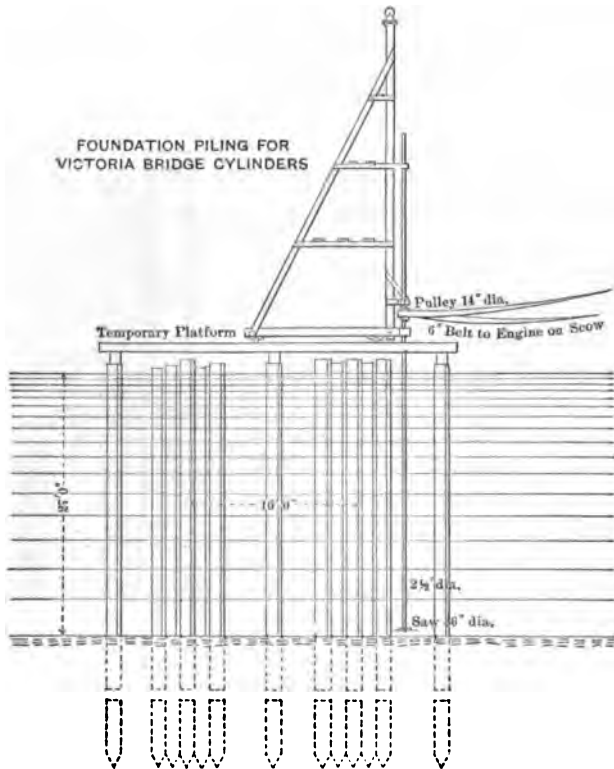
CIRCULAR SAW FOR CUTTING OFF PILES UNDER WATER.
